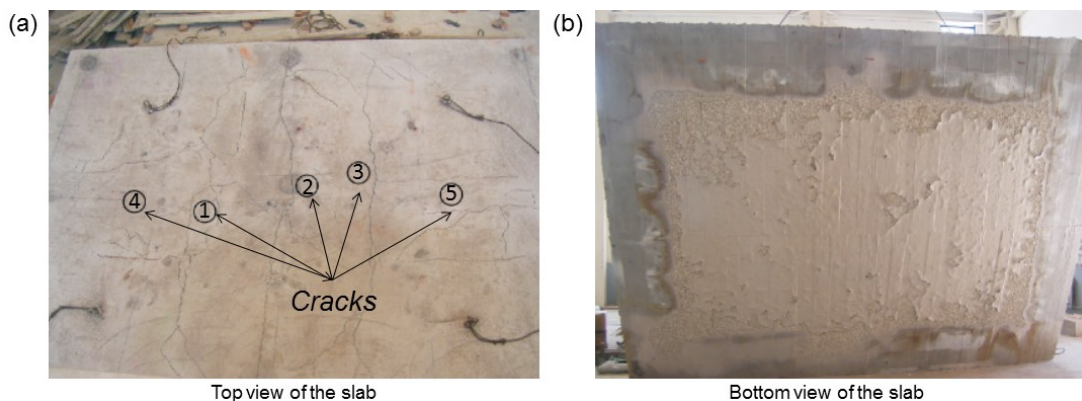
(a) Top view of slab and (b) bottom view of slab after the fire test reproduced from Zhang et al. (2014)
